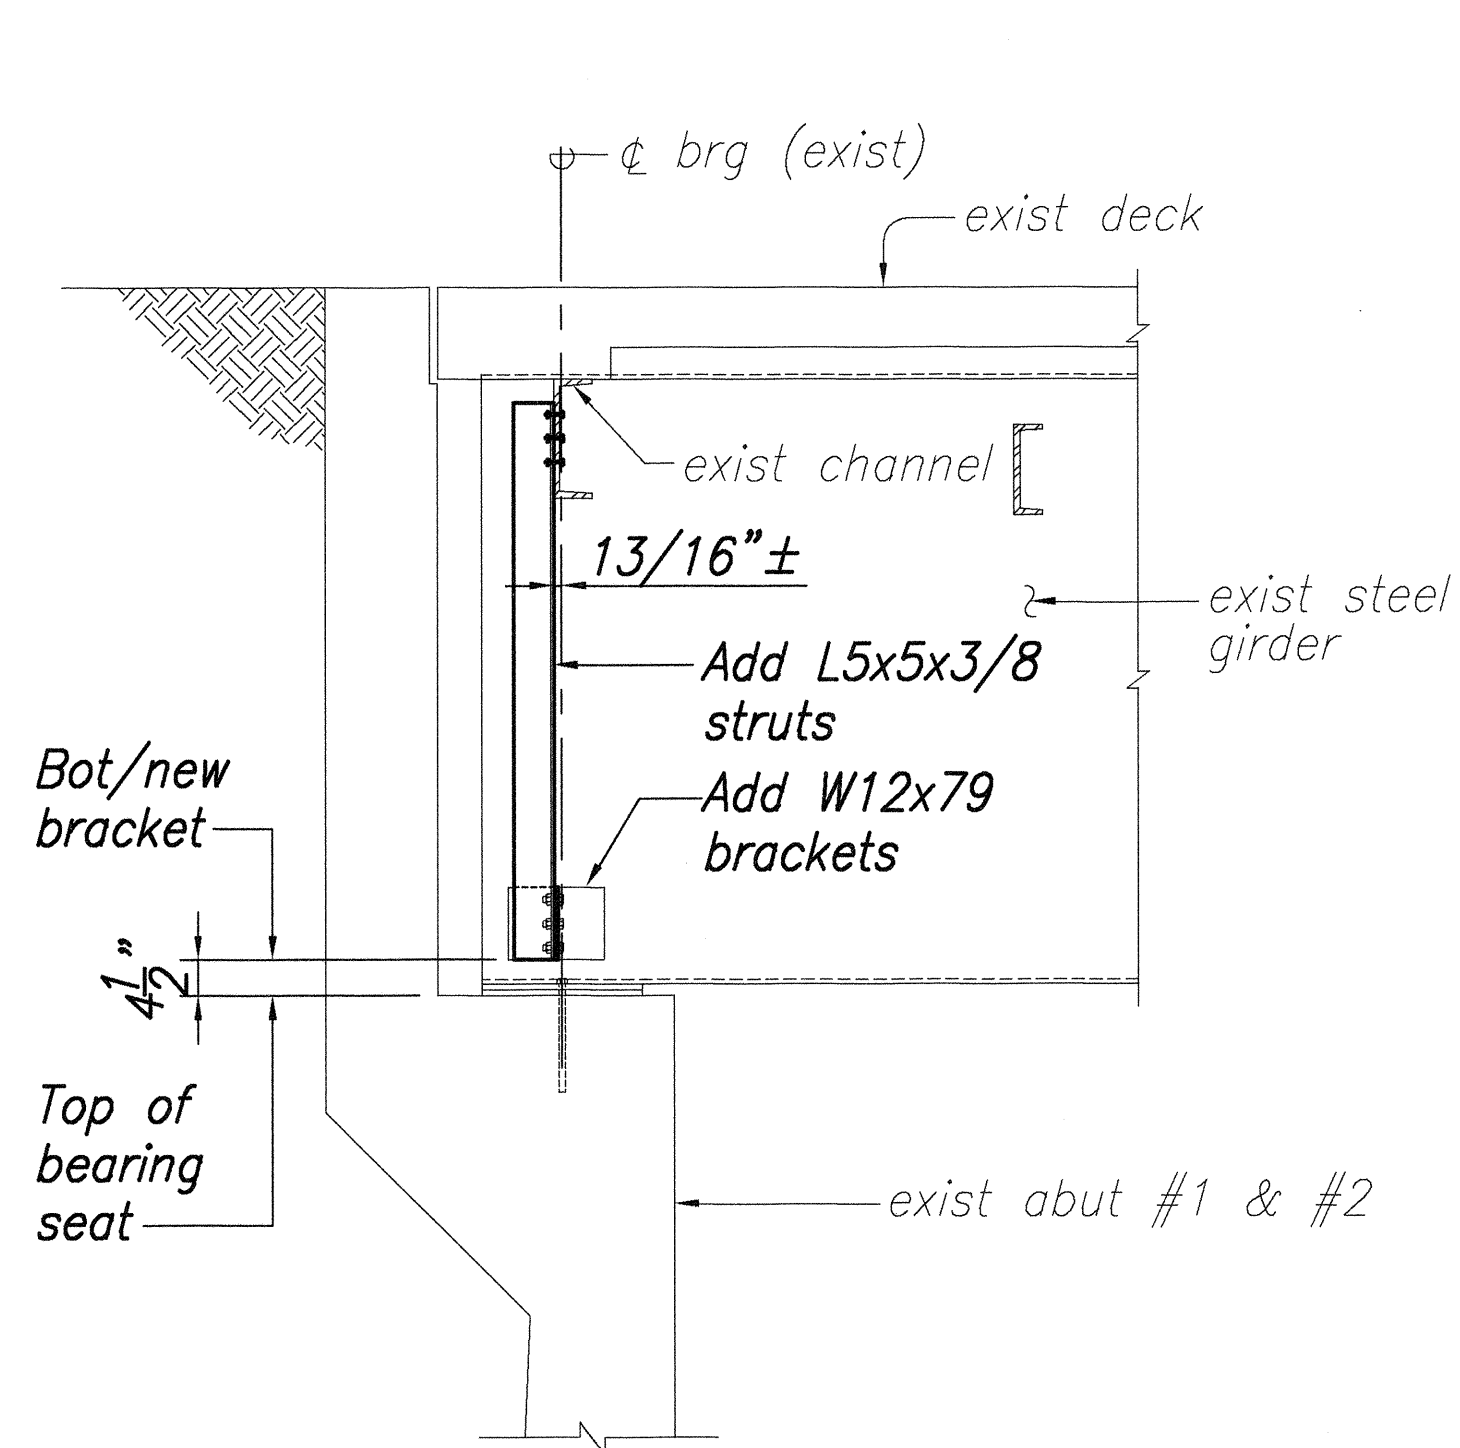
DETAIL OF ADDITIONAL STRUT TO EXIST. END DIAPHRAGM & CONCRETE BLOCK RESTRAINT
